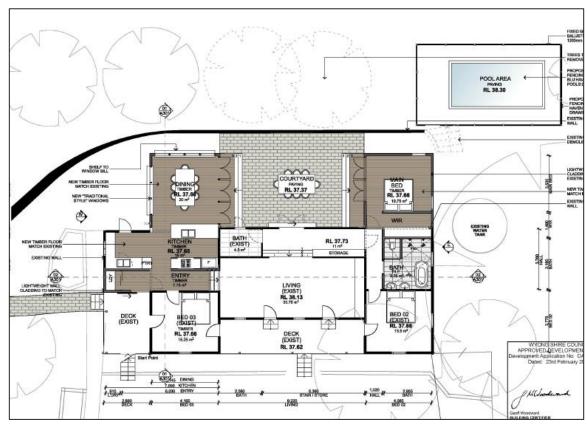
Approved Alterations and Additions to Dwelling - DA1418/2015
